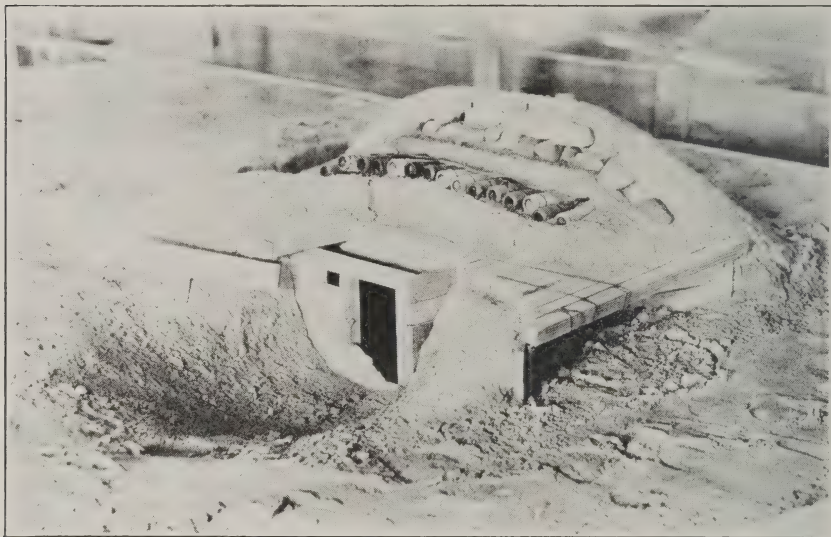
Machine Gun Emplacement. Cut and cover roof. Cover: 6 inches earth, 18 inches rock, 12 inches earth, steel rails, 18 inches earth, heavy timber.
